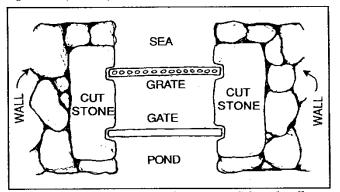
Drawing of typical mākāhā area in fishpond wall. (Modified from Kelly, 1975)
